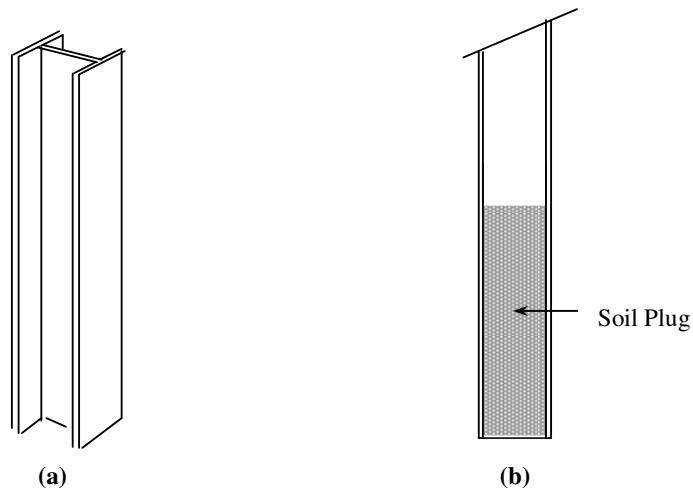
Cross section view of steel piles (a) H-section pile, (b) open ended steel tube piles
